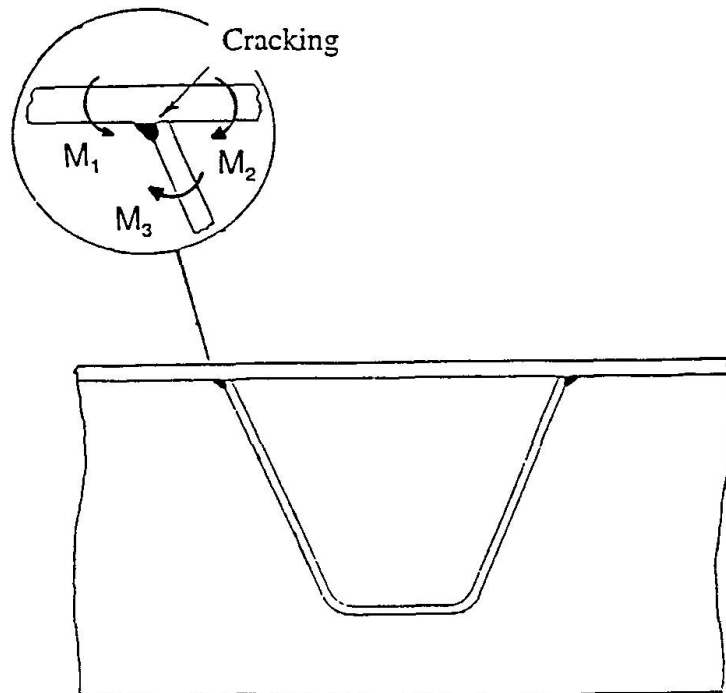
Distortion-induced cracking at longitudinal fillet-weld joining rib to deck plate
